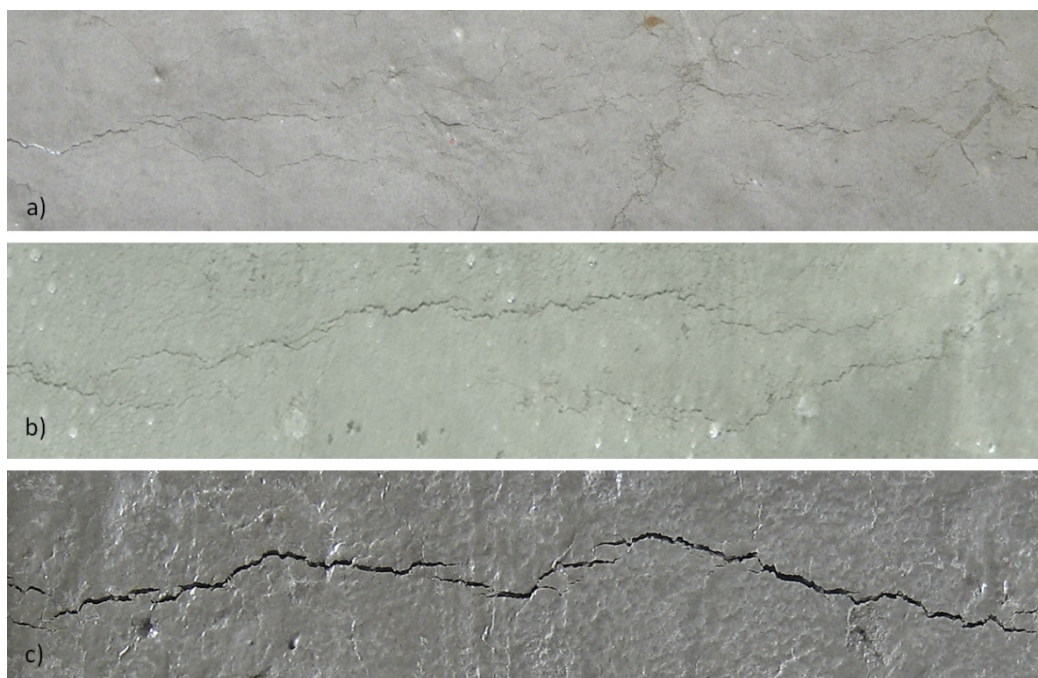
a) Typical plastic settlement crack pattern for L-box settlement cracking mould at Climate N1. b) Typical plastic settlement crack pattern for steel bar settlement cracking mould at Climate N1. c) Typical plastic shrinkage cracking pattern for shrinkage cracking mould at Climate E1.
